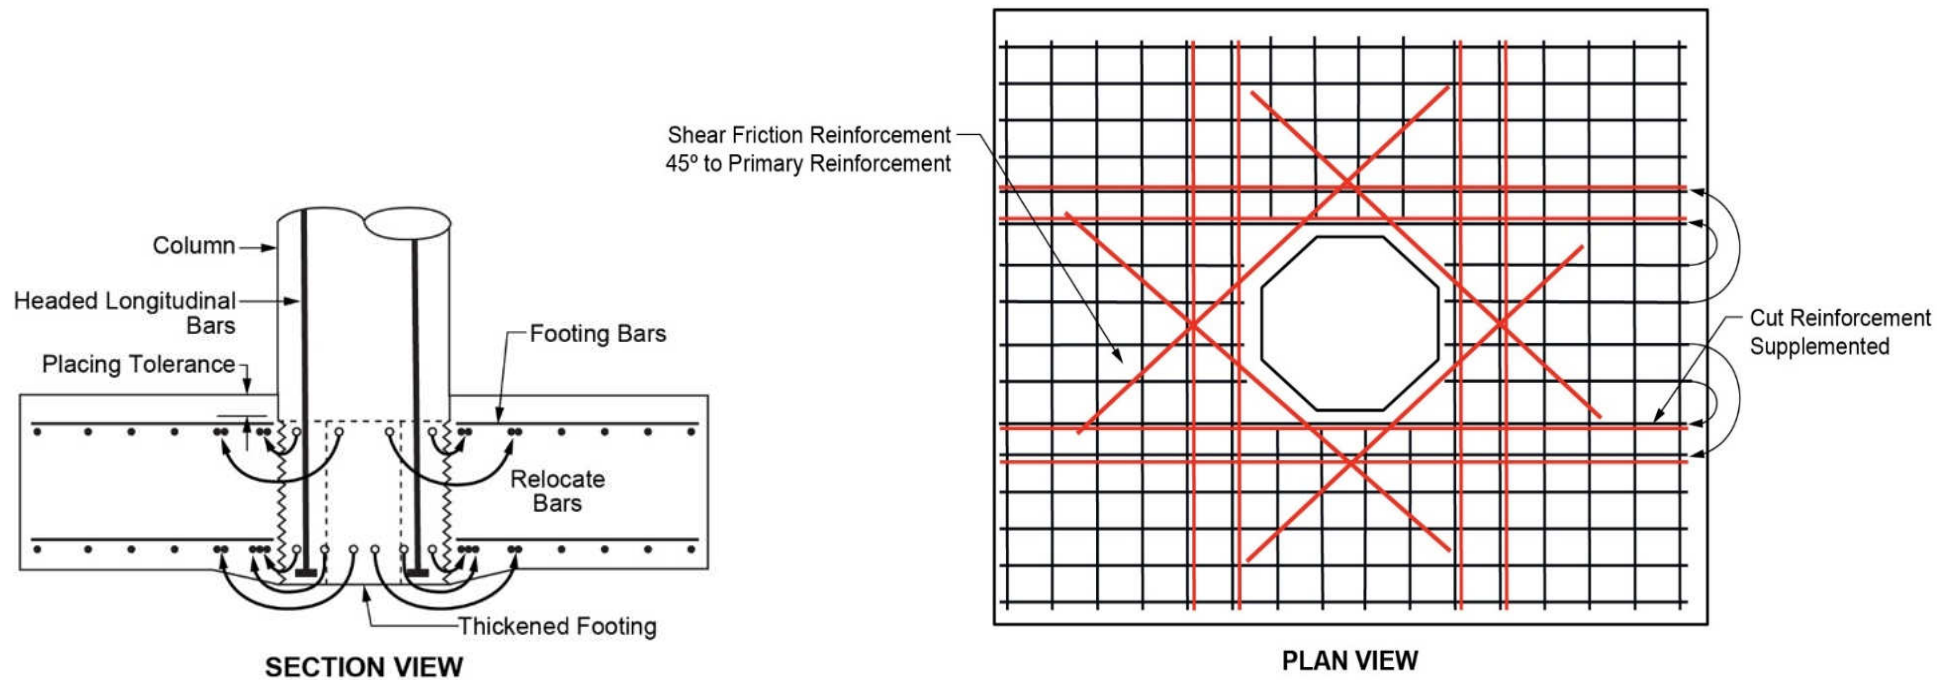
Placement of Footing Bars with a Socket Connection
